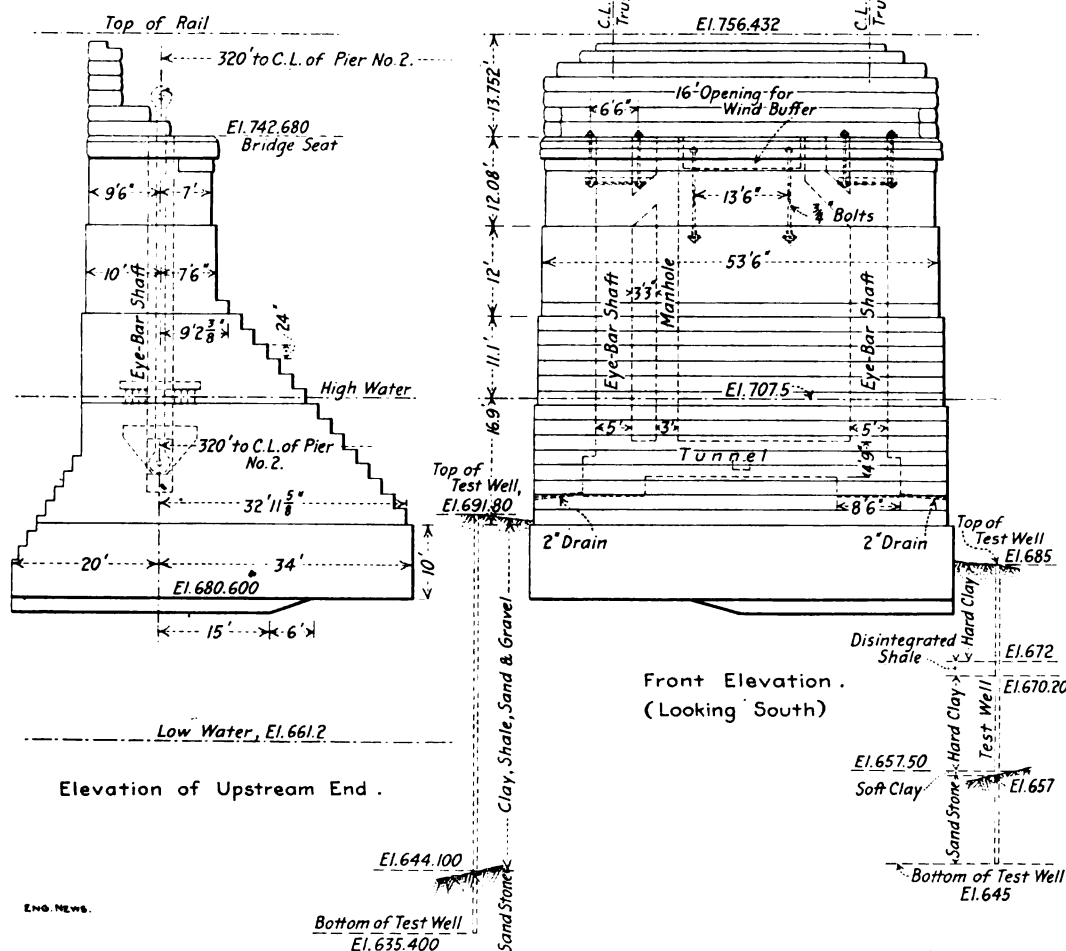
ELEVATIONS OF SOUTH ANCHORAGE ABUTMENT, P. & L. E. RY. BRIDGE OVER OHIO RIVER, AT BEAVER, PA.
